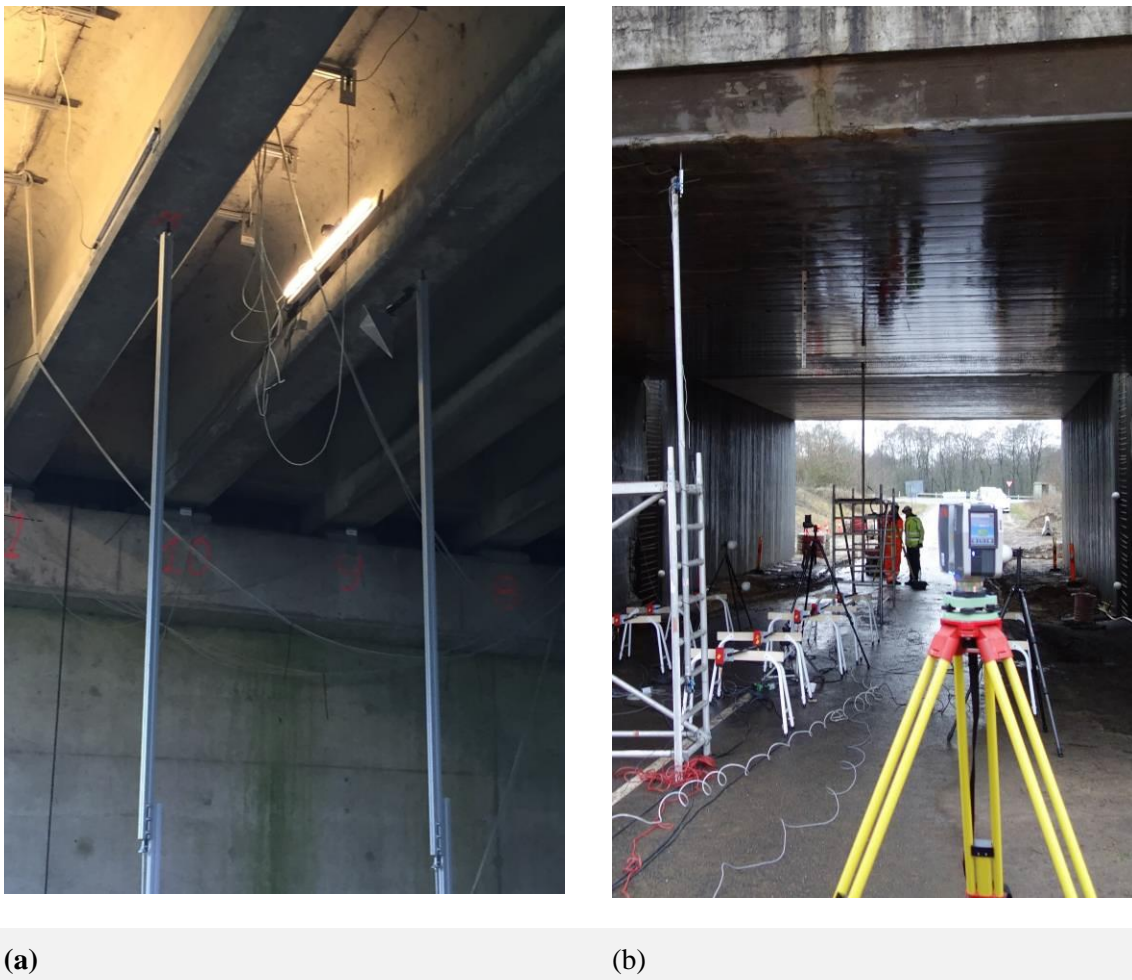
Instrumentation used during a test on a prestressed concrete bridge (a). Monitoring preparation for OT (overturned T-section) bridge (b).
